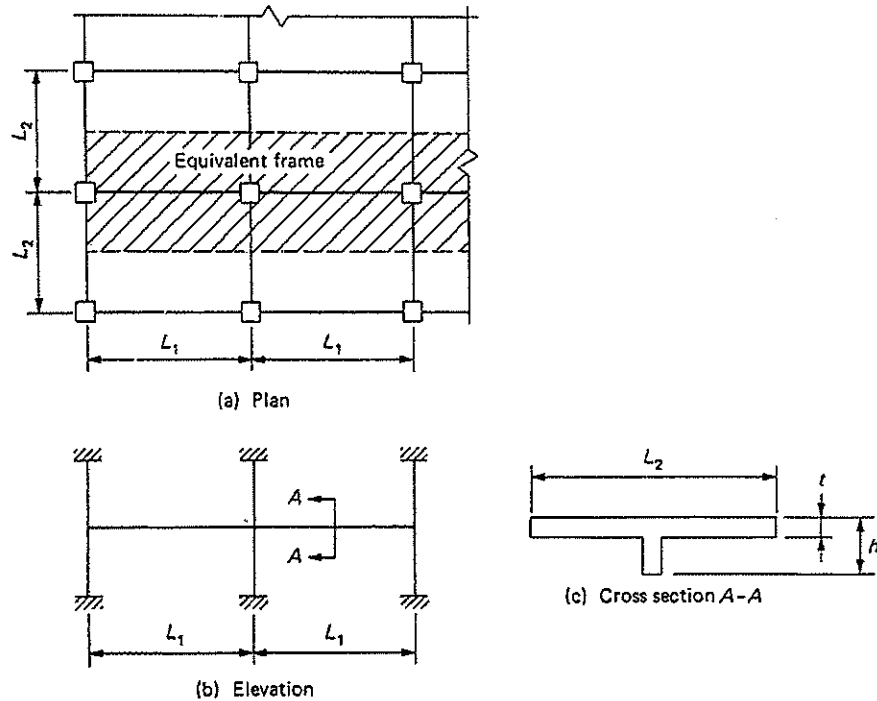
Plan, elevation, and cross-section of equivalent frame in a two-way floor system.
